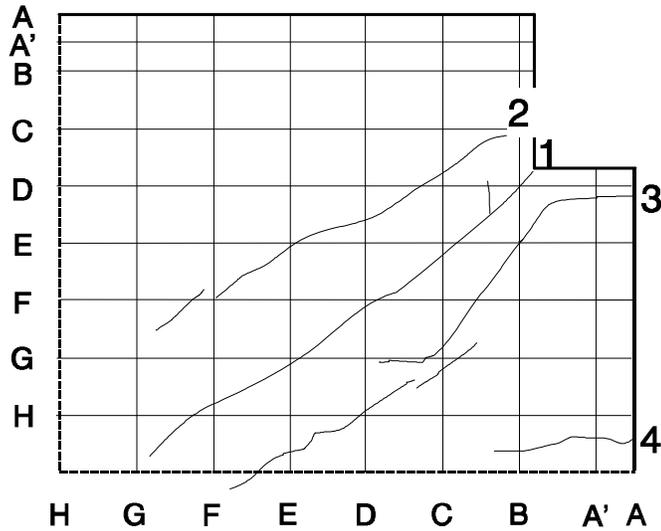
POJ-PS-100 cracking pattern on south face of joint at dead load
